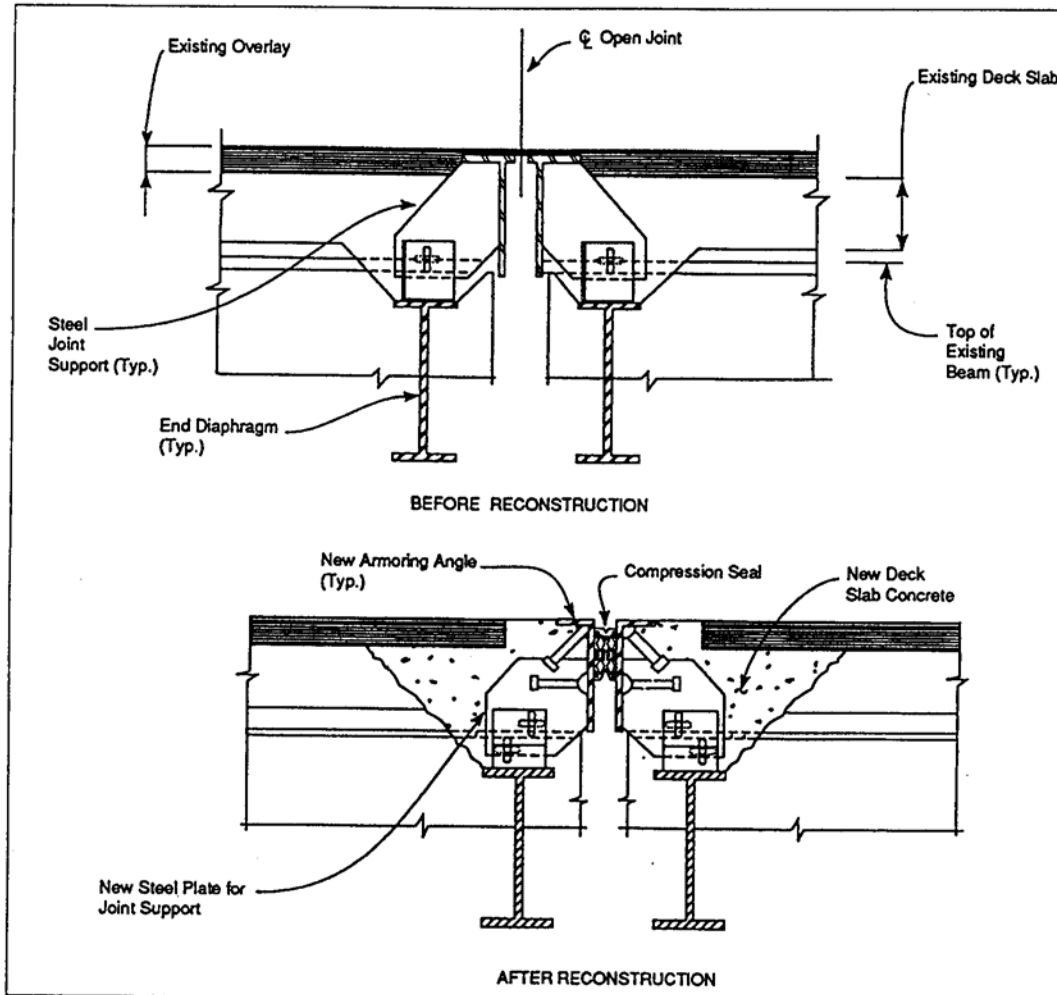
Replacement of open joint by armored compression seal for joints on the Golden State Parkway Bridge
